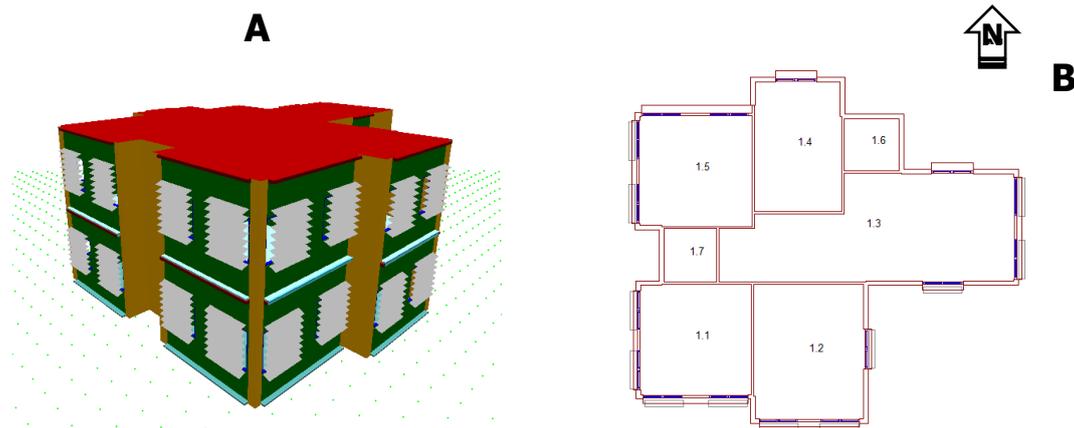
View of the 3D modelling building with the use of shading devices (A), and the plan of the building (B).
